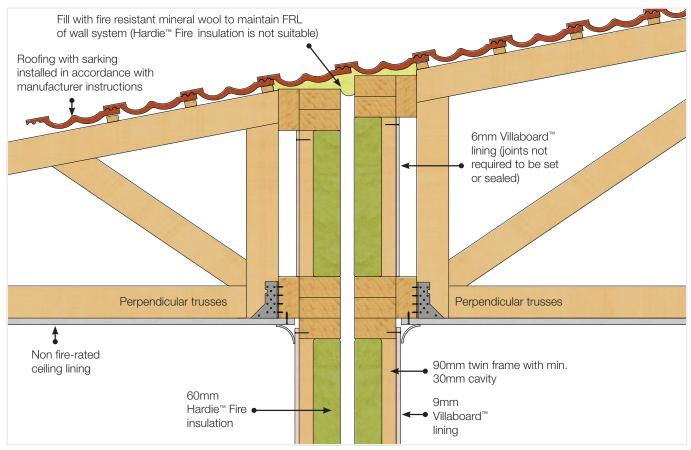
HARDIE™ SMART INTERTENANCY WALL SYSTEM WITH PERPENDICULAR ROOF TRUSSES
